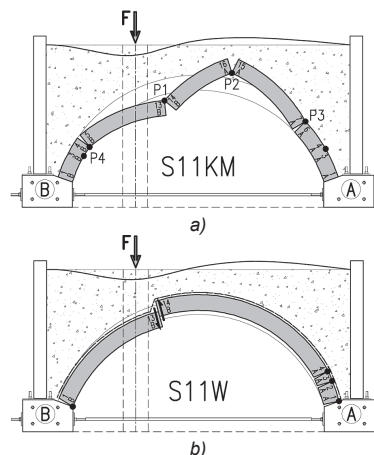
a) Specimen S11KM – failure mechanism developed; b) Specimen S11W – failure mode observed
